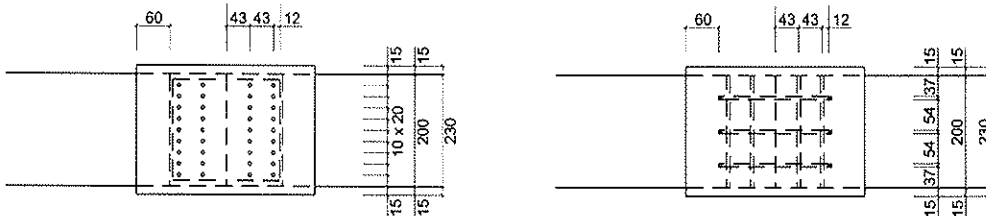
Connection D 01.4, 9x2 steel dowels, connection protected by „Fermacell“ gypsum plasterboards of 15 or 18 mm thickness, fixed according to technical rules of the manufacturers
